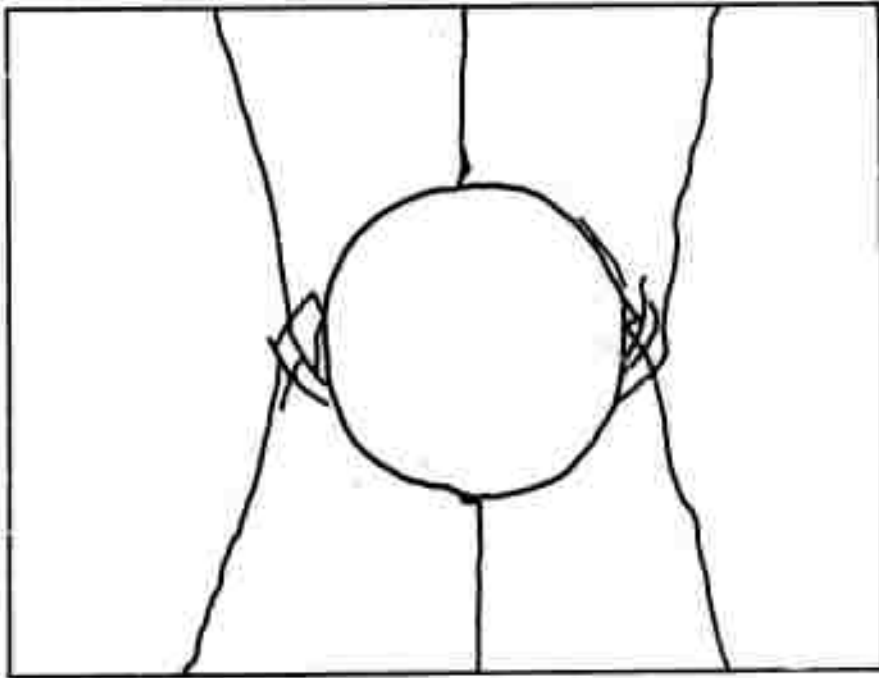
FRACTURES DEVELOPED IN MODEL TEST
